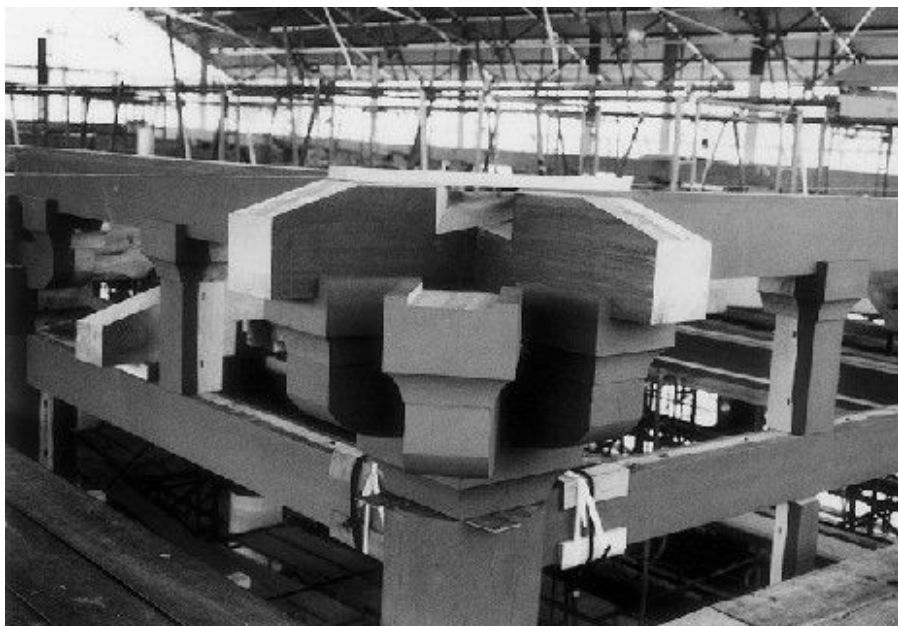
The modified “gooseneck” splice of wall purlins over a bracket complex.
